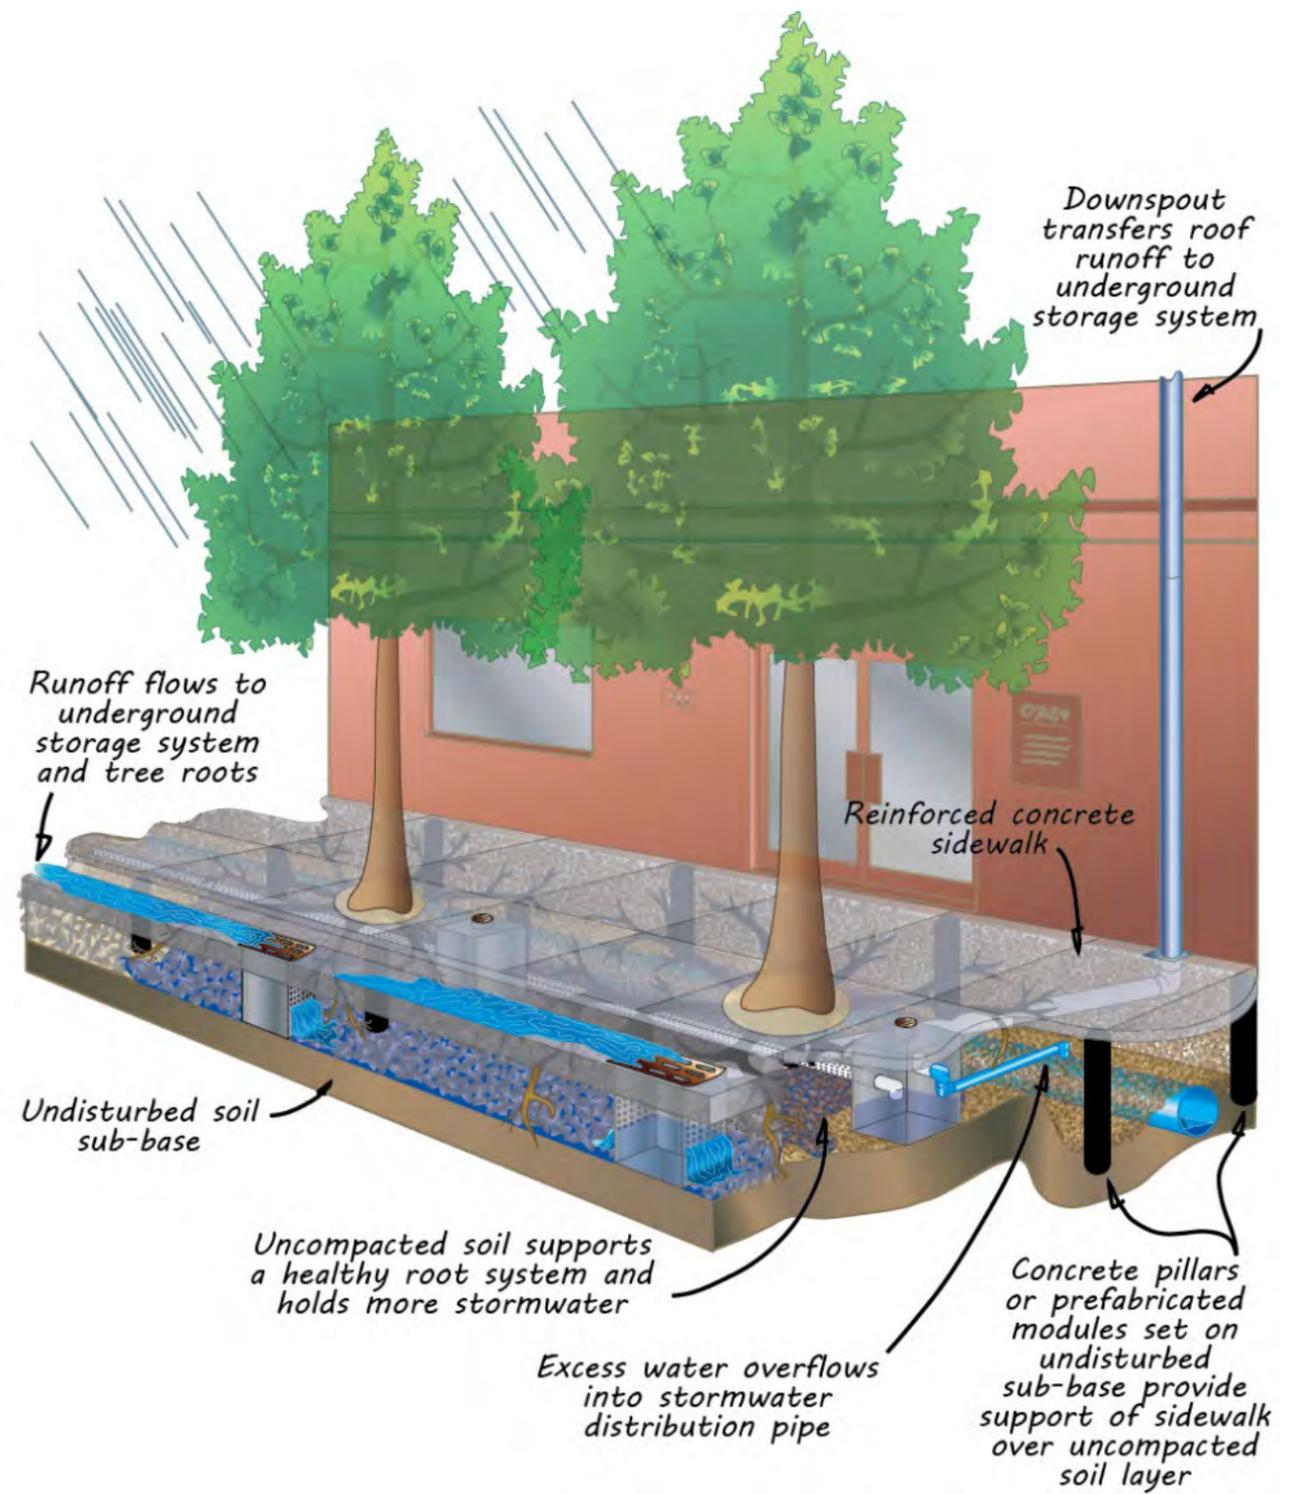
Suspended sidewalks use pillars or structured cell systems to support reinforced concrete, increasing the volume of uncompacted soil in subsurface planting areas and enhancing both root growth and stormwater storage.
